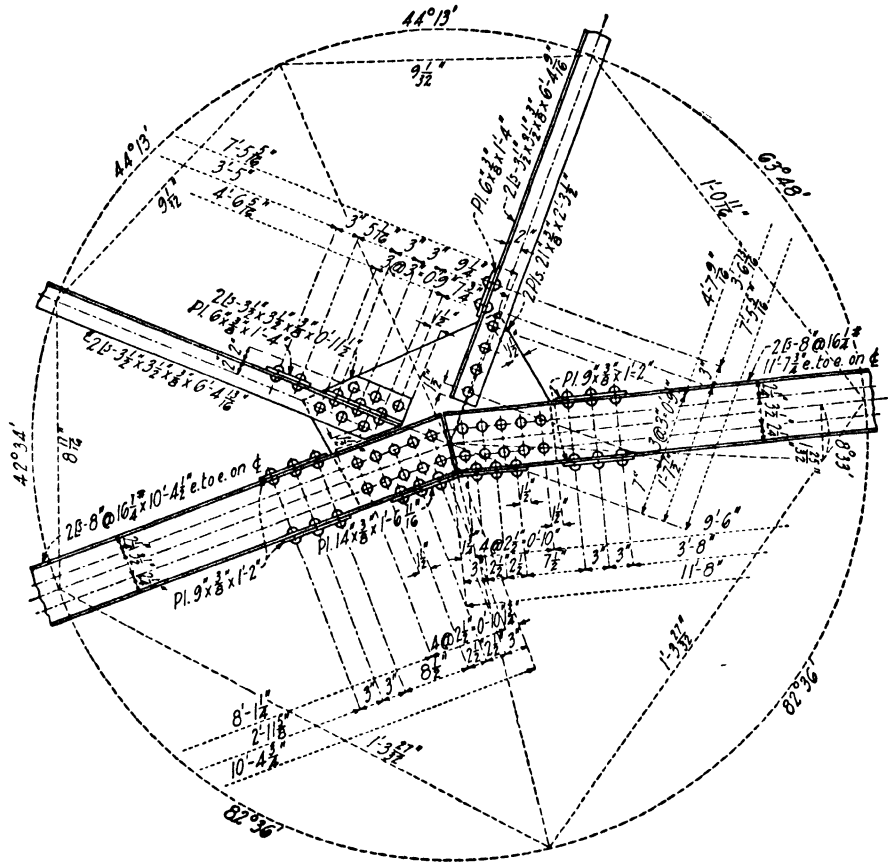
JOINT OF ROOF TRUSS COMPLETELY DETAILED.
